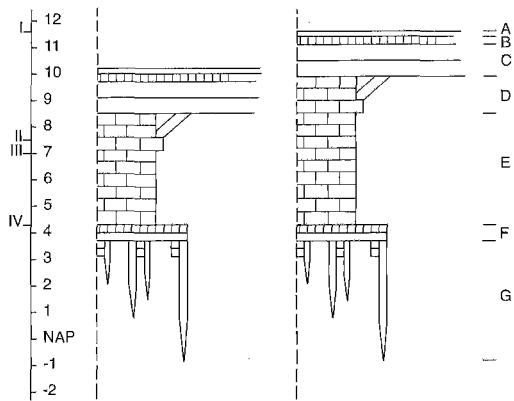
Reconstruction of the height of the bridge (scale 1:200). Legend: A road surface; B rafters; C bridge girders; D shores; E pier; F foundation mattress; G foundation piles, cofferdam and framework; A-D superstructure; F-G foundation; I average land surface in Roman Cuijk; II highest high water level around AD 350; III average high water level around AD 350; IV lowest low water level around AD 350.
